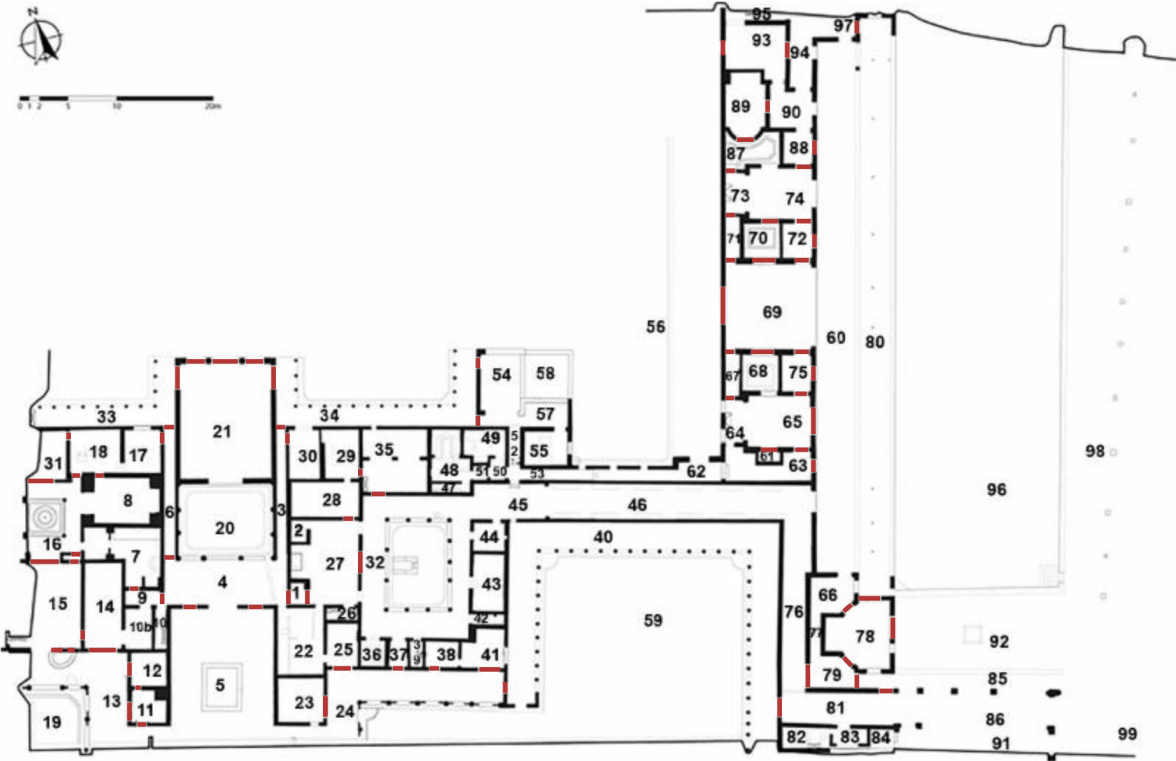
Plan of Villa A with known locations of closeable windows and doors marked in red. Adapted from plan by T. Liddell.
